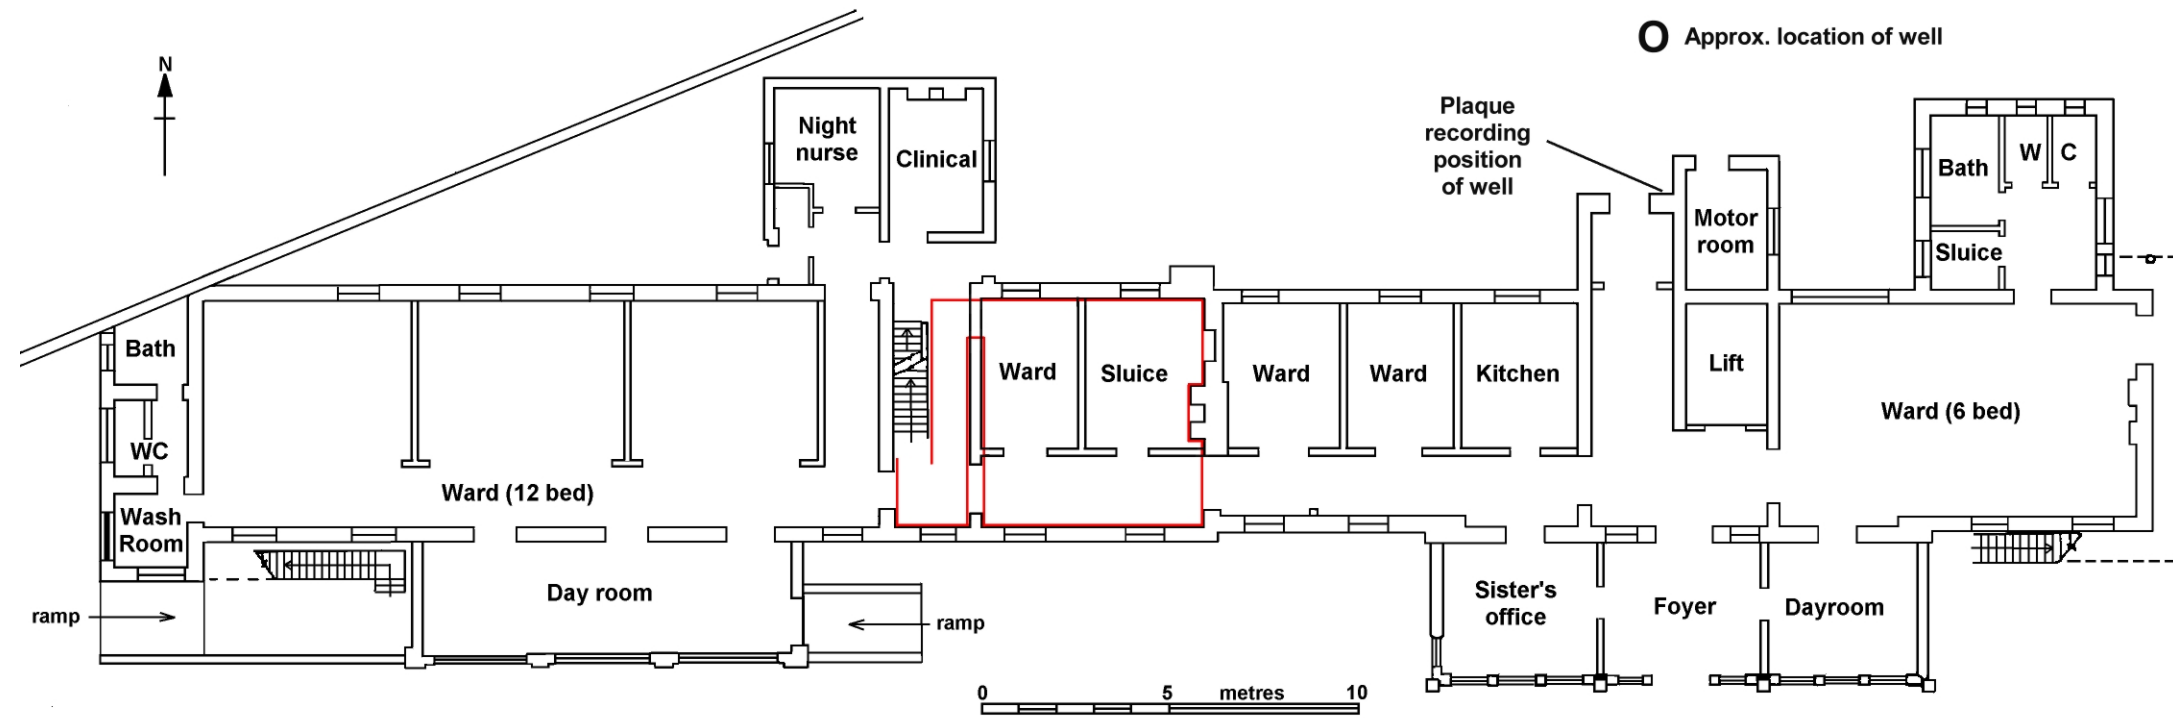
[08], cellar (shown in red) & ground floor plan (scale 1:200)
